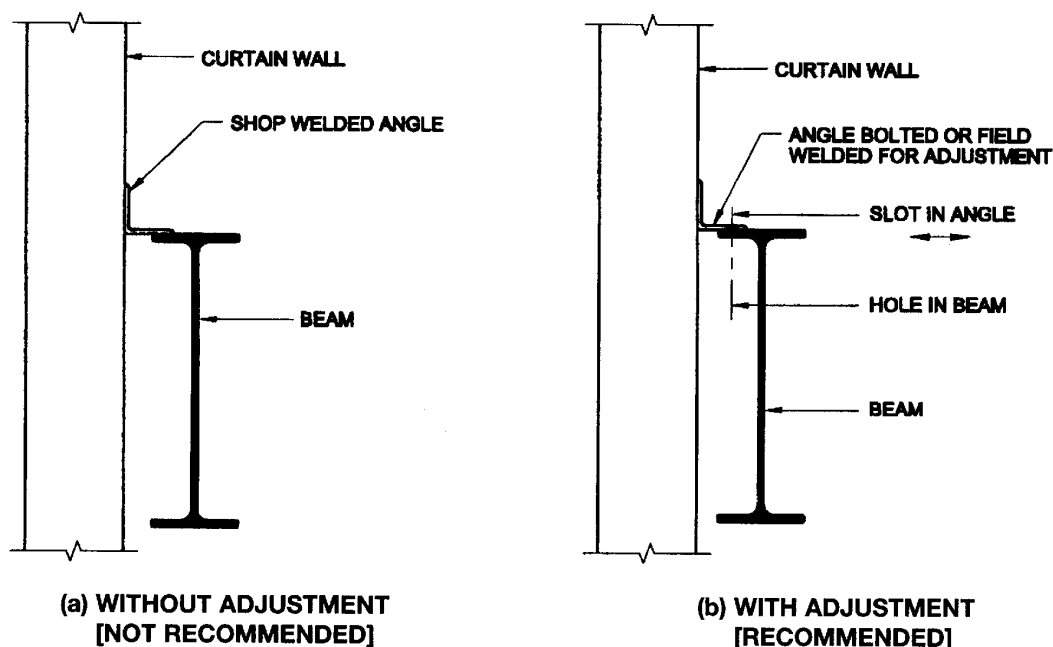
Attaching curtain-wall façade systems to structural steel framing.
